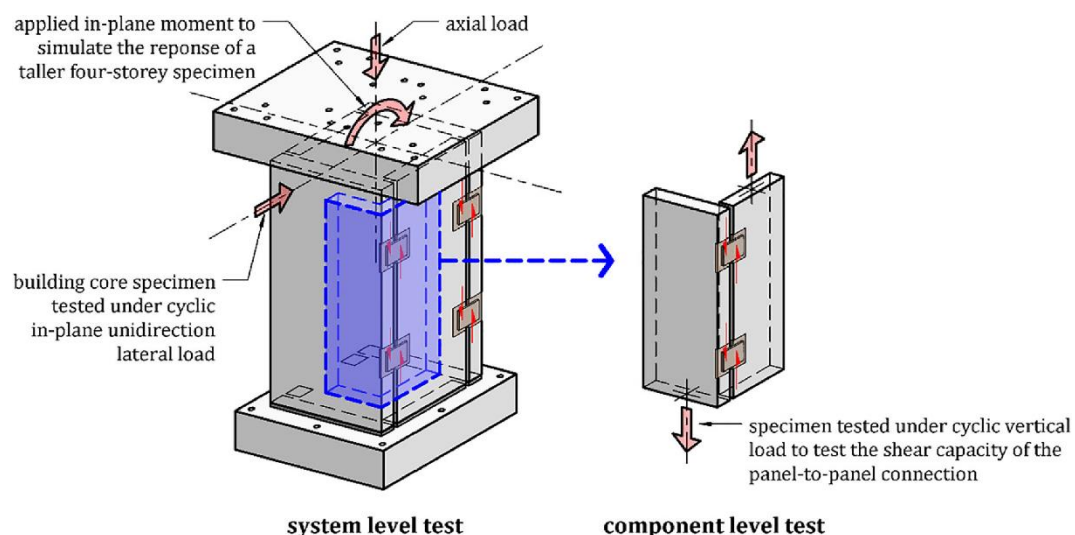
Precast concrete core-wall research schematics: (a) system level testing, and (b) orthogonal joint testing (photo taken from article published in *Engineering Structures*, Vol 207, Menegon, Scott J., Wilson, John L., Lam, Nelson T.K., Gad, Emad F., *Experimental testing of innovative panel-to-panel connections for precast concrete building cores*, 1-15, Copyright Elsevier (2020b).)
